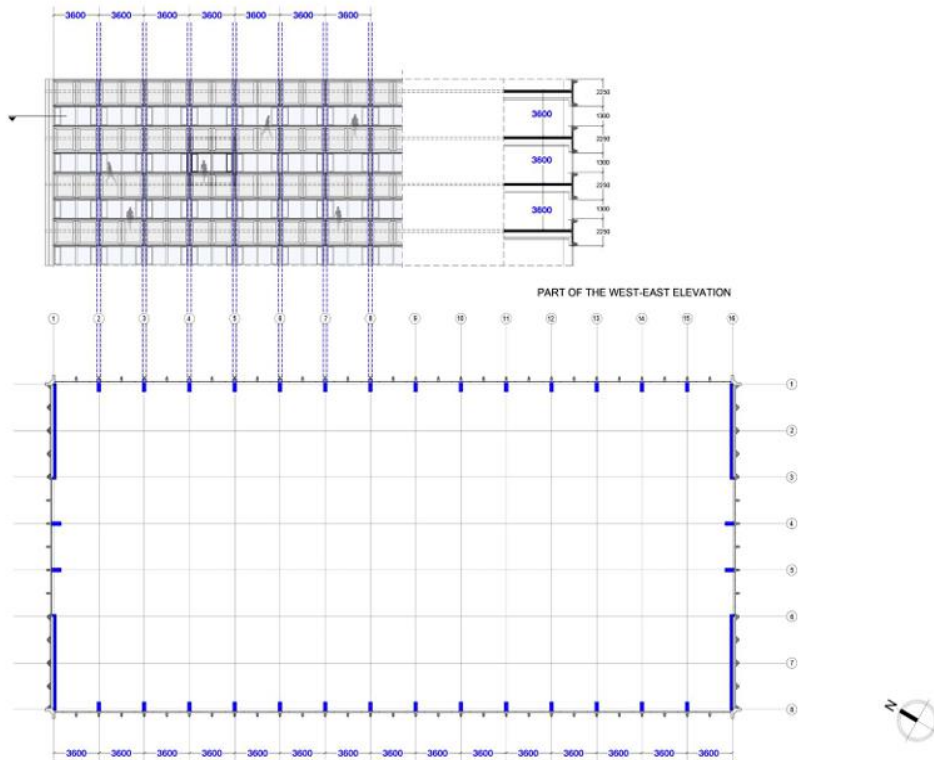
Facade Structural Grid and Perimeter Column Distribution
